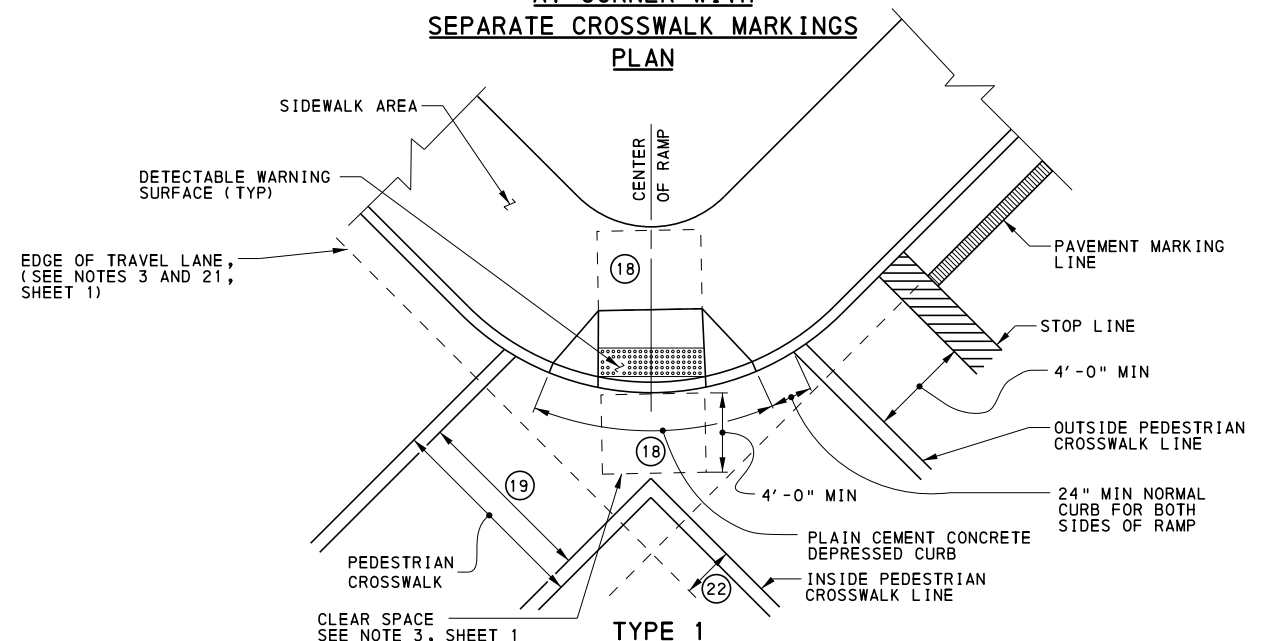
DETAIL A CLEAR SPACE AT CROSSWALK MARKINGS PLAN (DIAGONAL - REQUIRES ASSISTANT DISTRICT EXECUTIVE APPROVAL)
